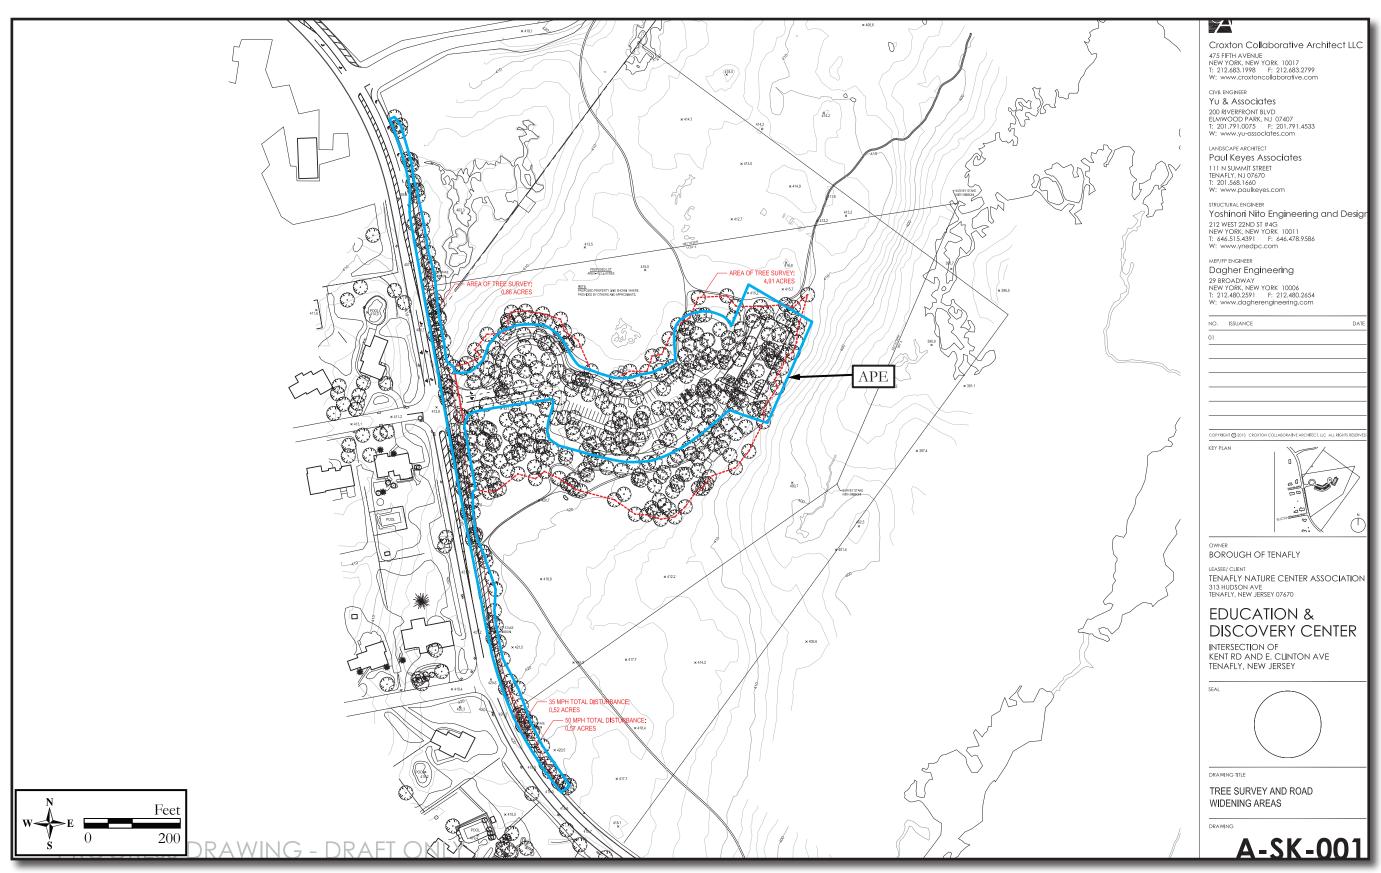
Site Plan (Croxton Collaborative Architects LLC, 2013).
